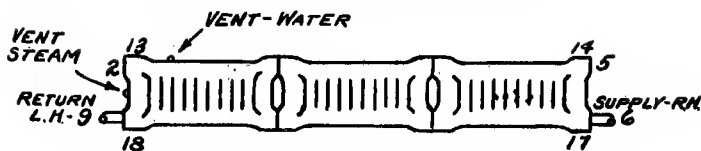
Assembled in single tier. Water or one and two pipe steam.
